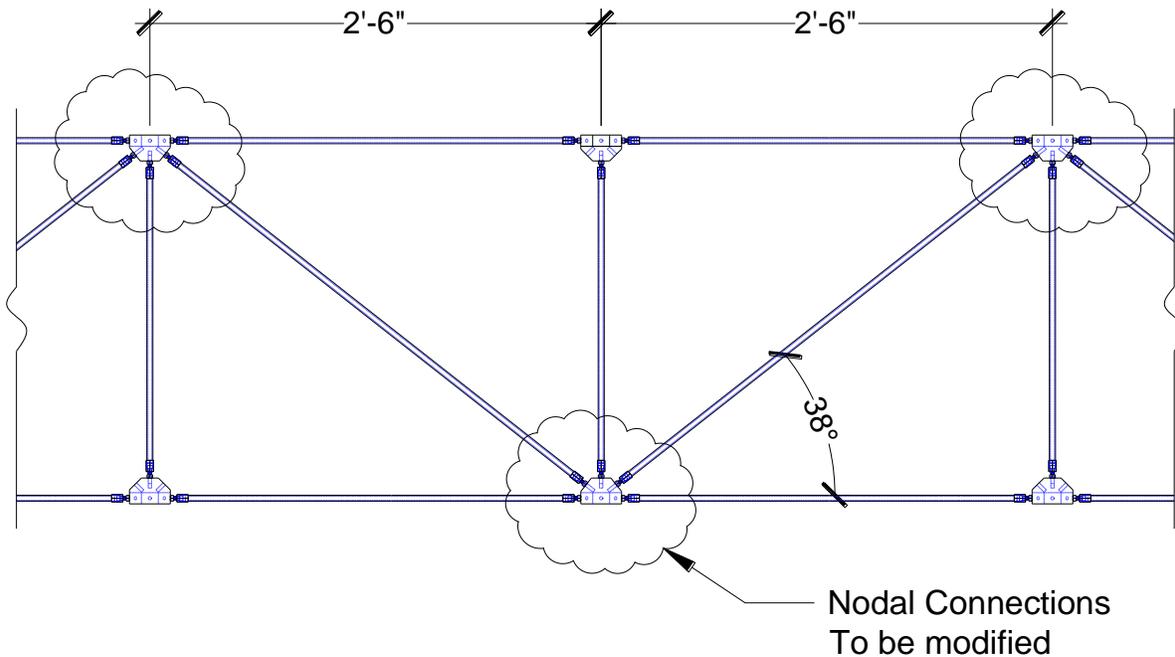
Plan section of the bottom deck of the truss to identify the Modified Connection Blocks
